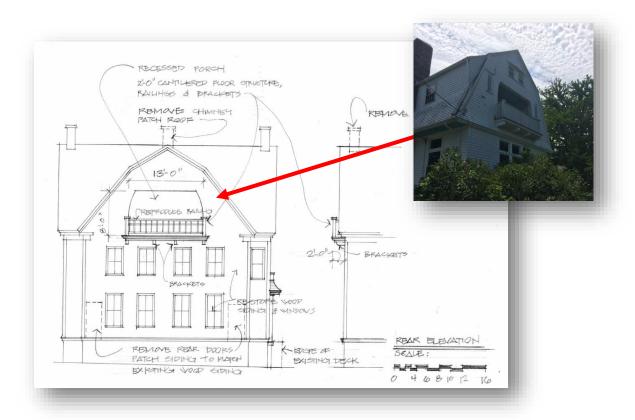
Proposed Exterior Alterations to Rear Elevation
